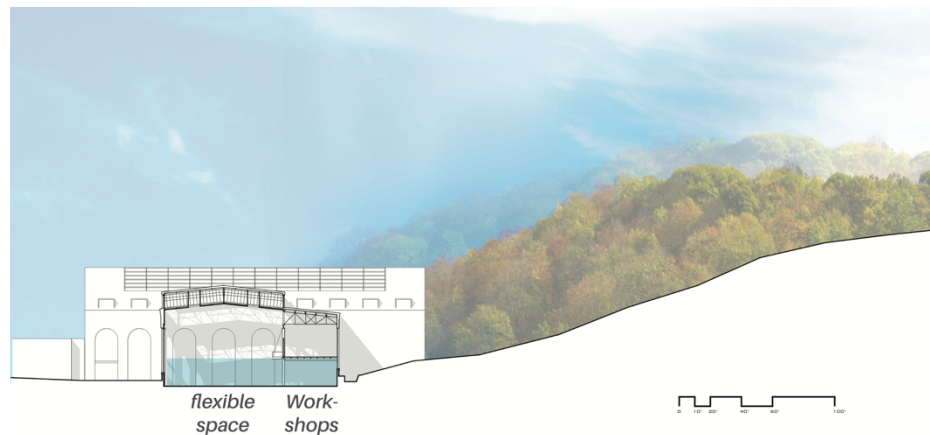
, Transverse Section, Workshops and Flexible Space (Source: Author)
